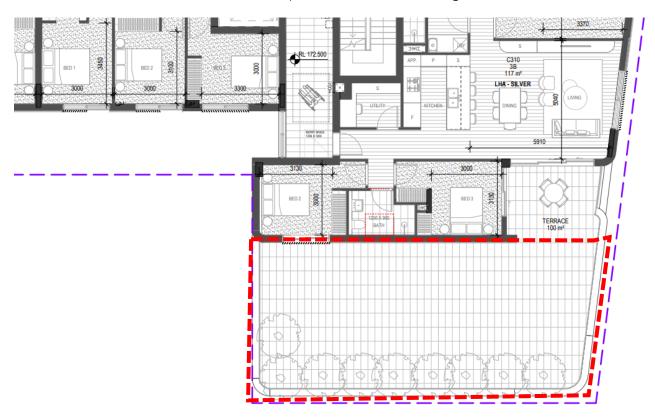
Location of the proposed variation on Building C, Level 3 floor plan (outlined in red)
